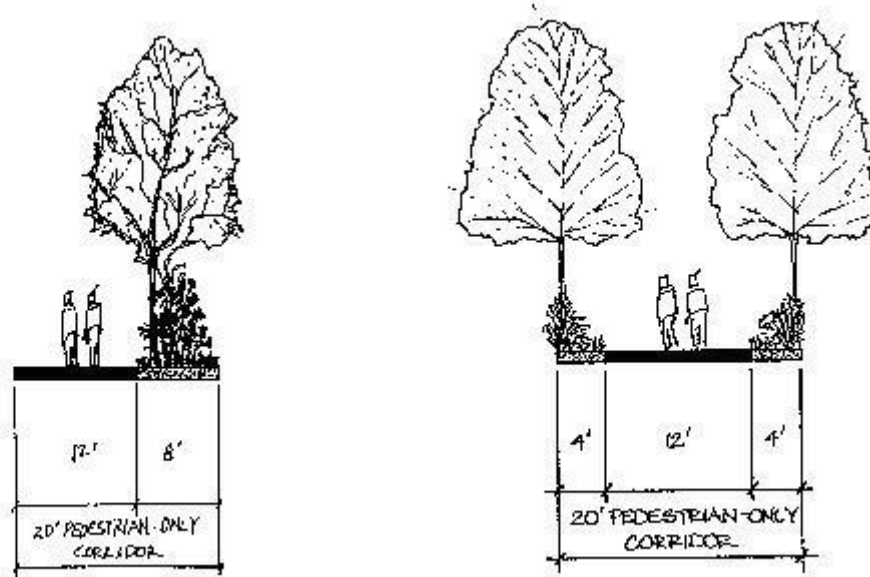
PEDESTRIAN CORRIDOR CROSS SECTION
